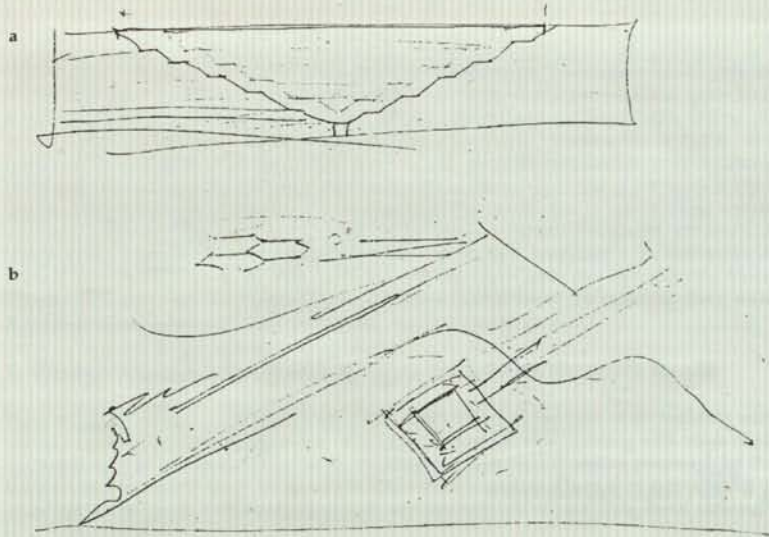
Aalto sketches of North wall - Plan & Moon Garden Room section (A.A. Archive - no date)
